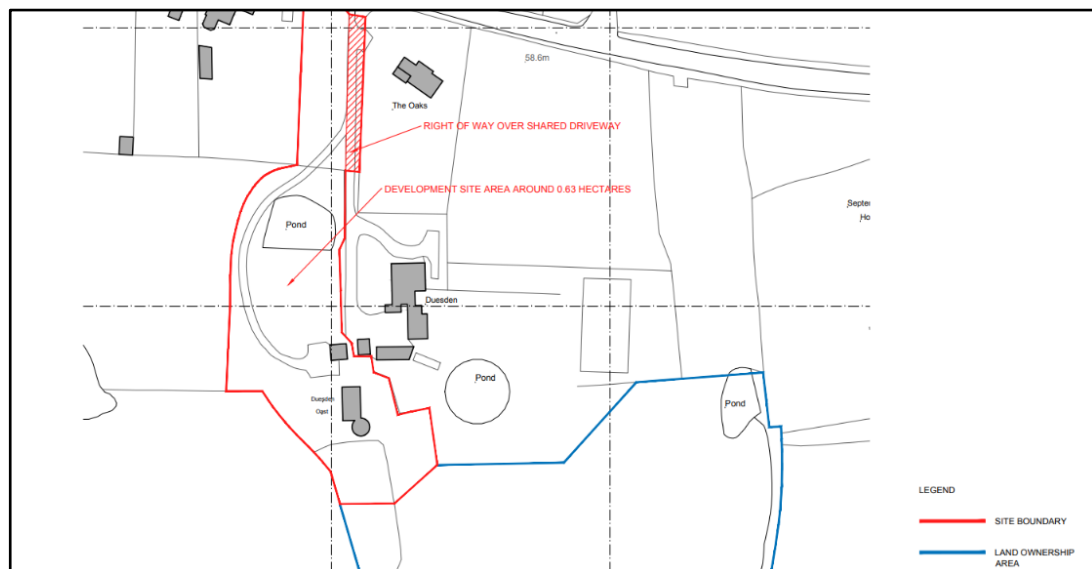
SITE LOCATION PLAN (AV ARCHITECTS)
